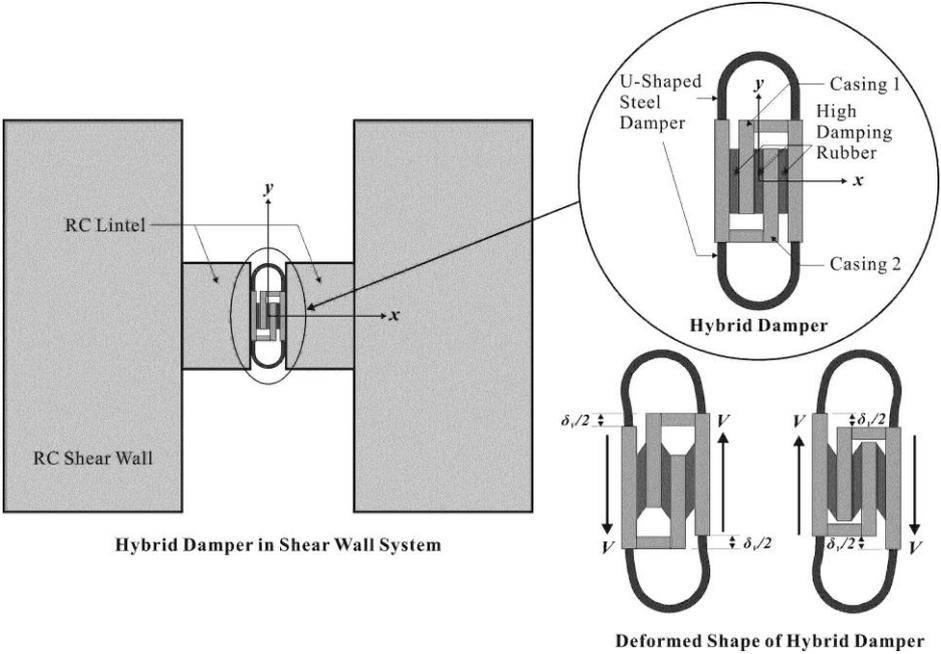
Schematic drawing of a hybrid damper embedded into a coupling beam connecting RC shear walls and the deformed shapes of a hybrid damper
